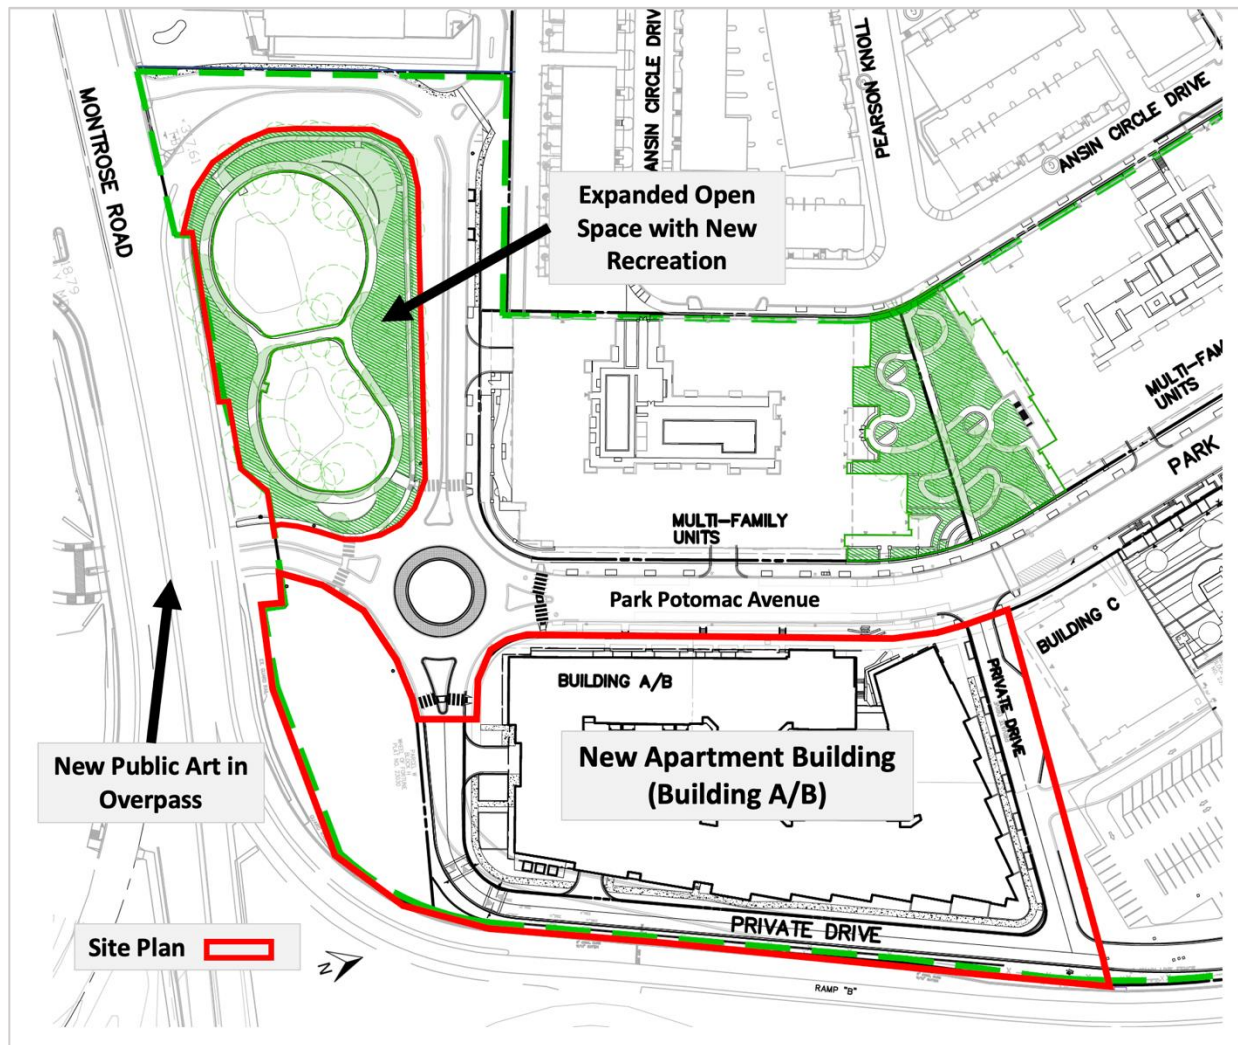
Proposed Site Plan with new apartment building, expanded public open space, recreation, and public art
